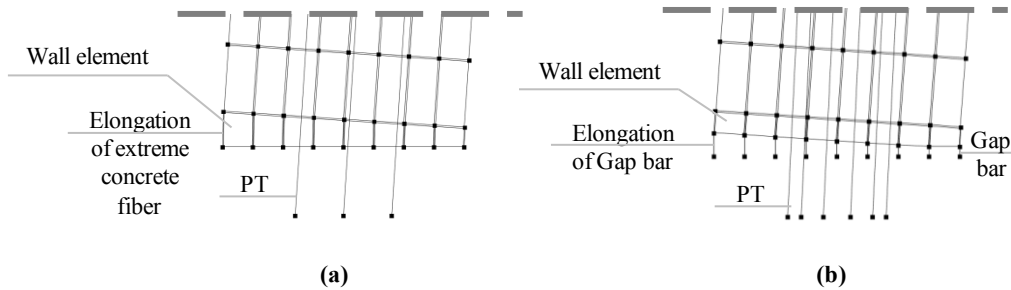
Modeling of gap opening at base of UPT wall as (a) elongation of wall element; (b) elongation of gap bar
